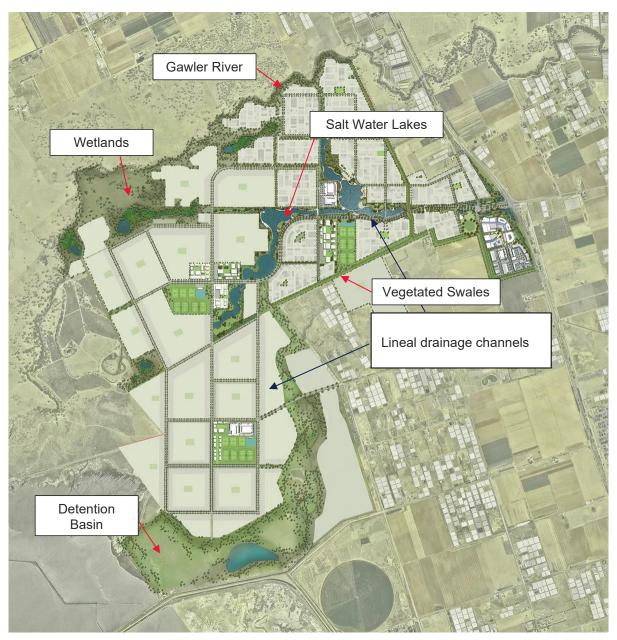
Proposed Lake and Lineal Open Drainage System
